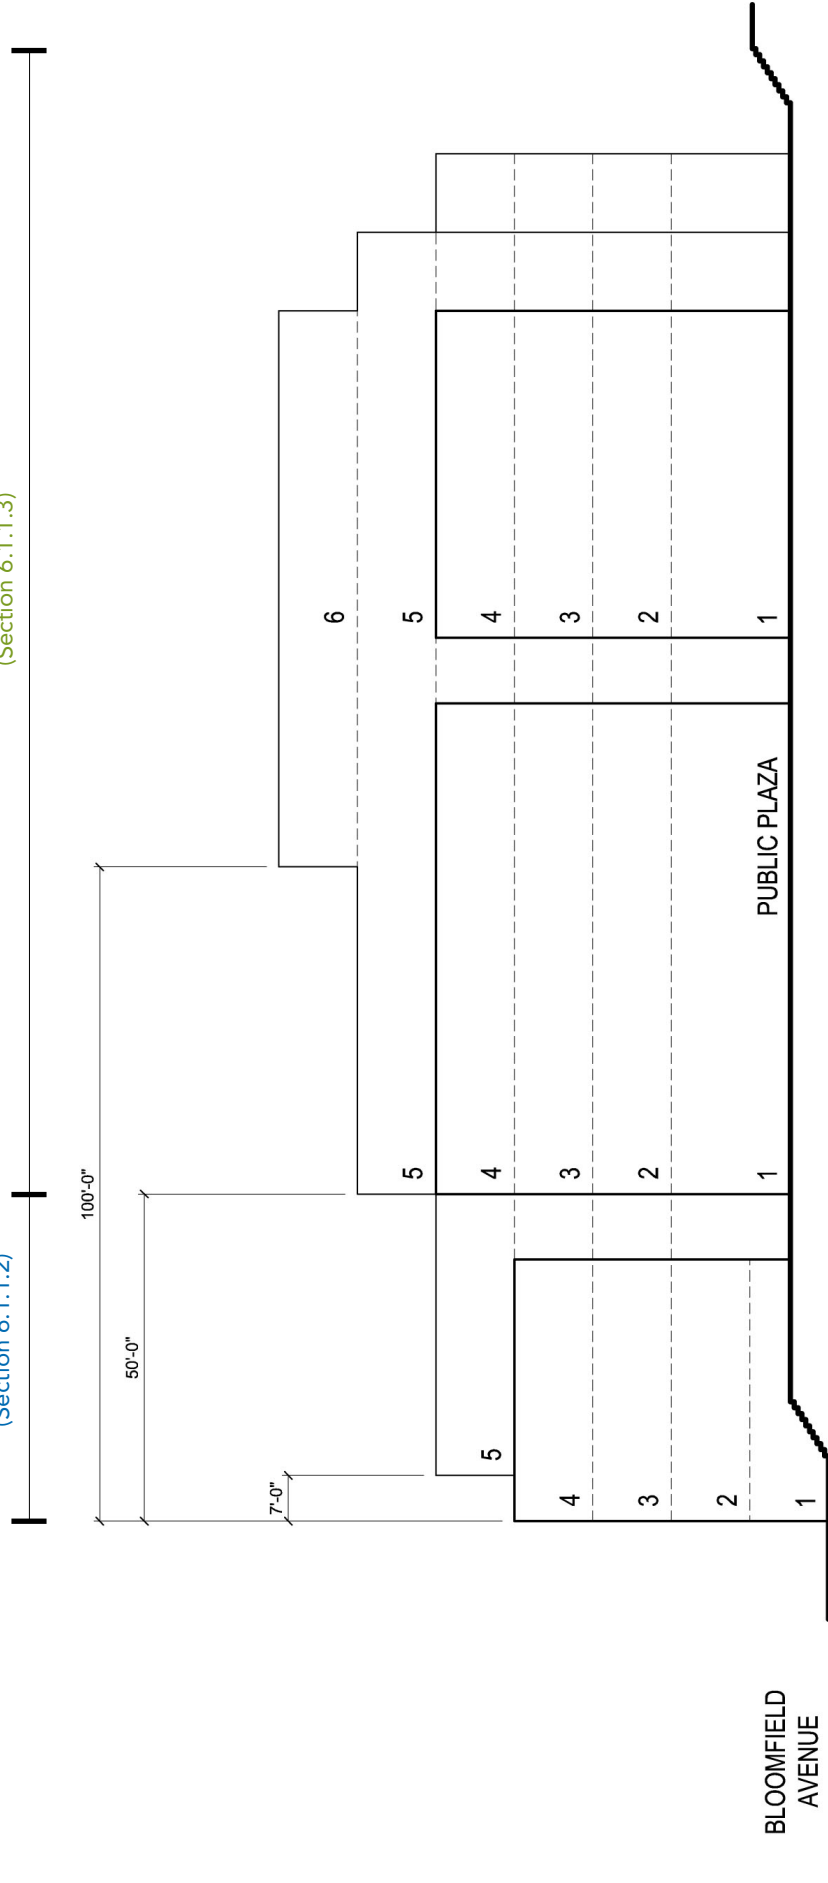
DEMARICATION OF BUILDING FACADE ALONG PUBLIC PLAZA/SEYMOUR STREET | SEYMOUR STREET REDEVELOPMENT PLAN | Phillips Preiss Grygjel LLC 2016
